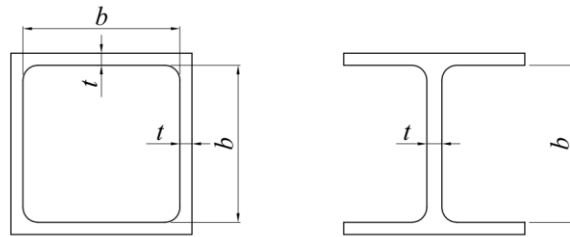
Flange and Web of Box-Shaped Cross-Section Member and Web of I-Shaped Cross-Section Member
